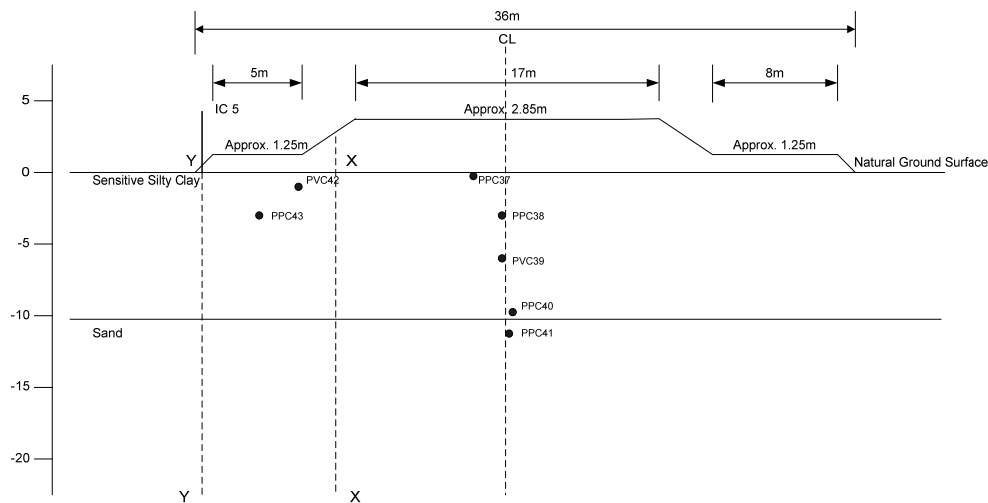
Cross section showing instrumentation layout plan for Section C (PVD at 2m spacing)
